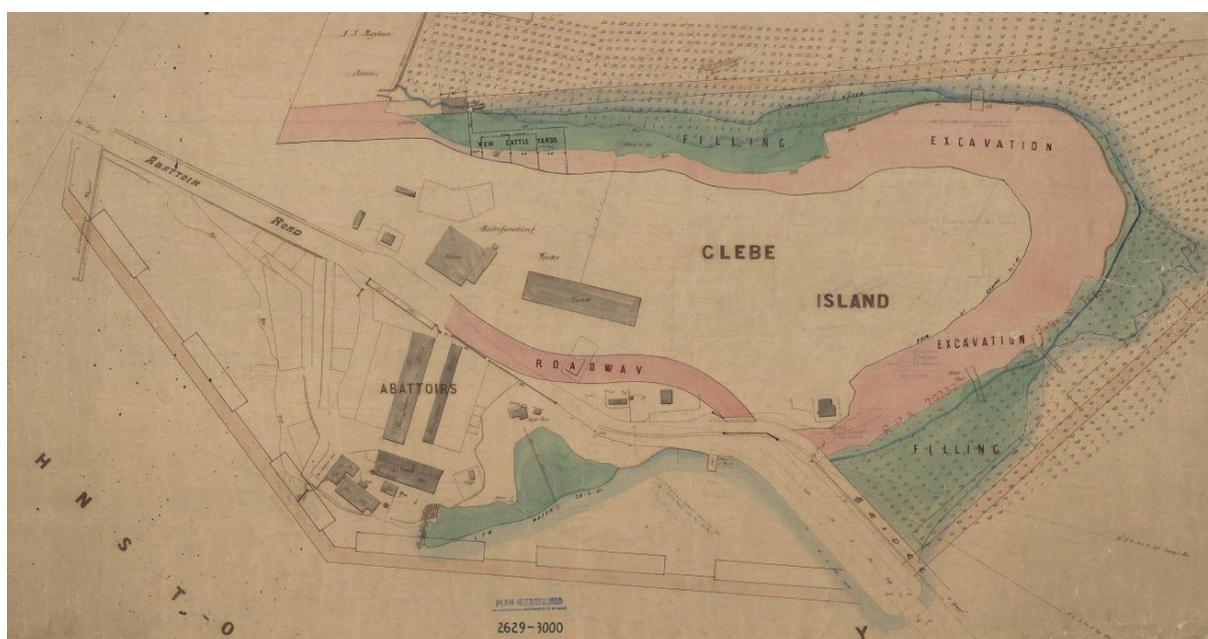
Plan for proposed wharfage accommodation at Glebe Island, dated March 1899, showing the Glebe Island Abattoirs after extensions, including the refrigeration works and cattle wharf. Excavation areas are shaded pink, and infill areas are shaded green. The realignment of Abattoir is also noted in pink. Source: NSW LRS, Crown Plan 2629-3000
